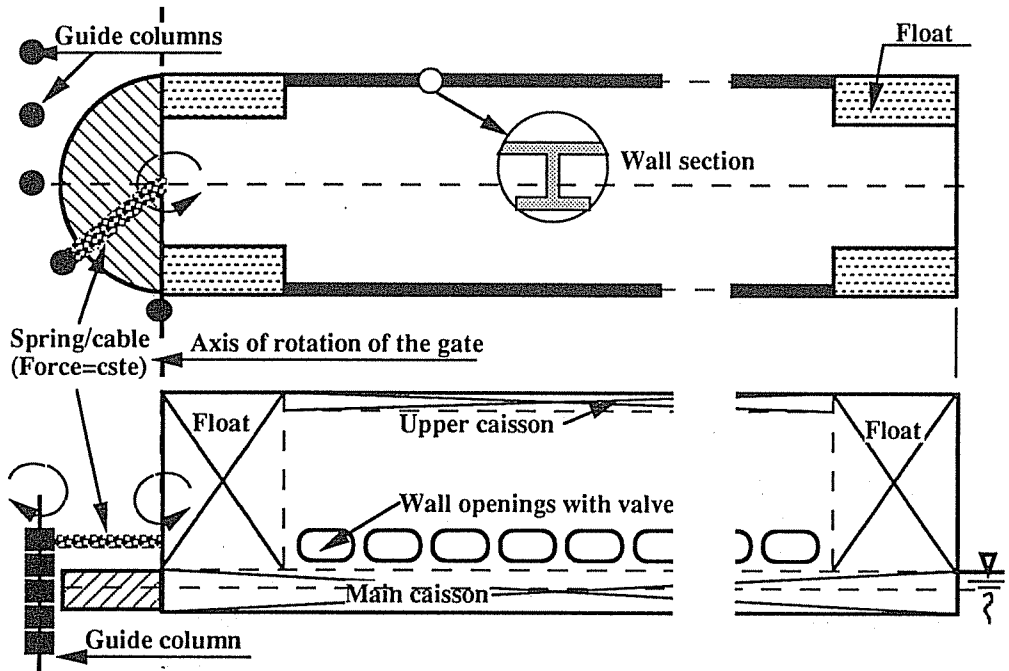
a Details of the floating barrier (cross section, plan view and front view).
